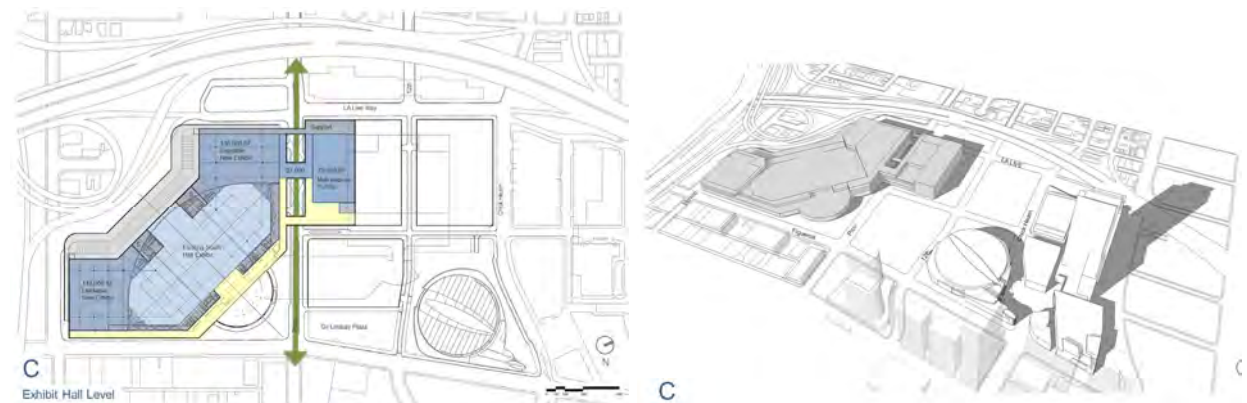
Exhibit level floor plan and massing – concept design scheme C (180,000ft<sup>2</sup> of net new exhibit space)
